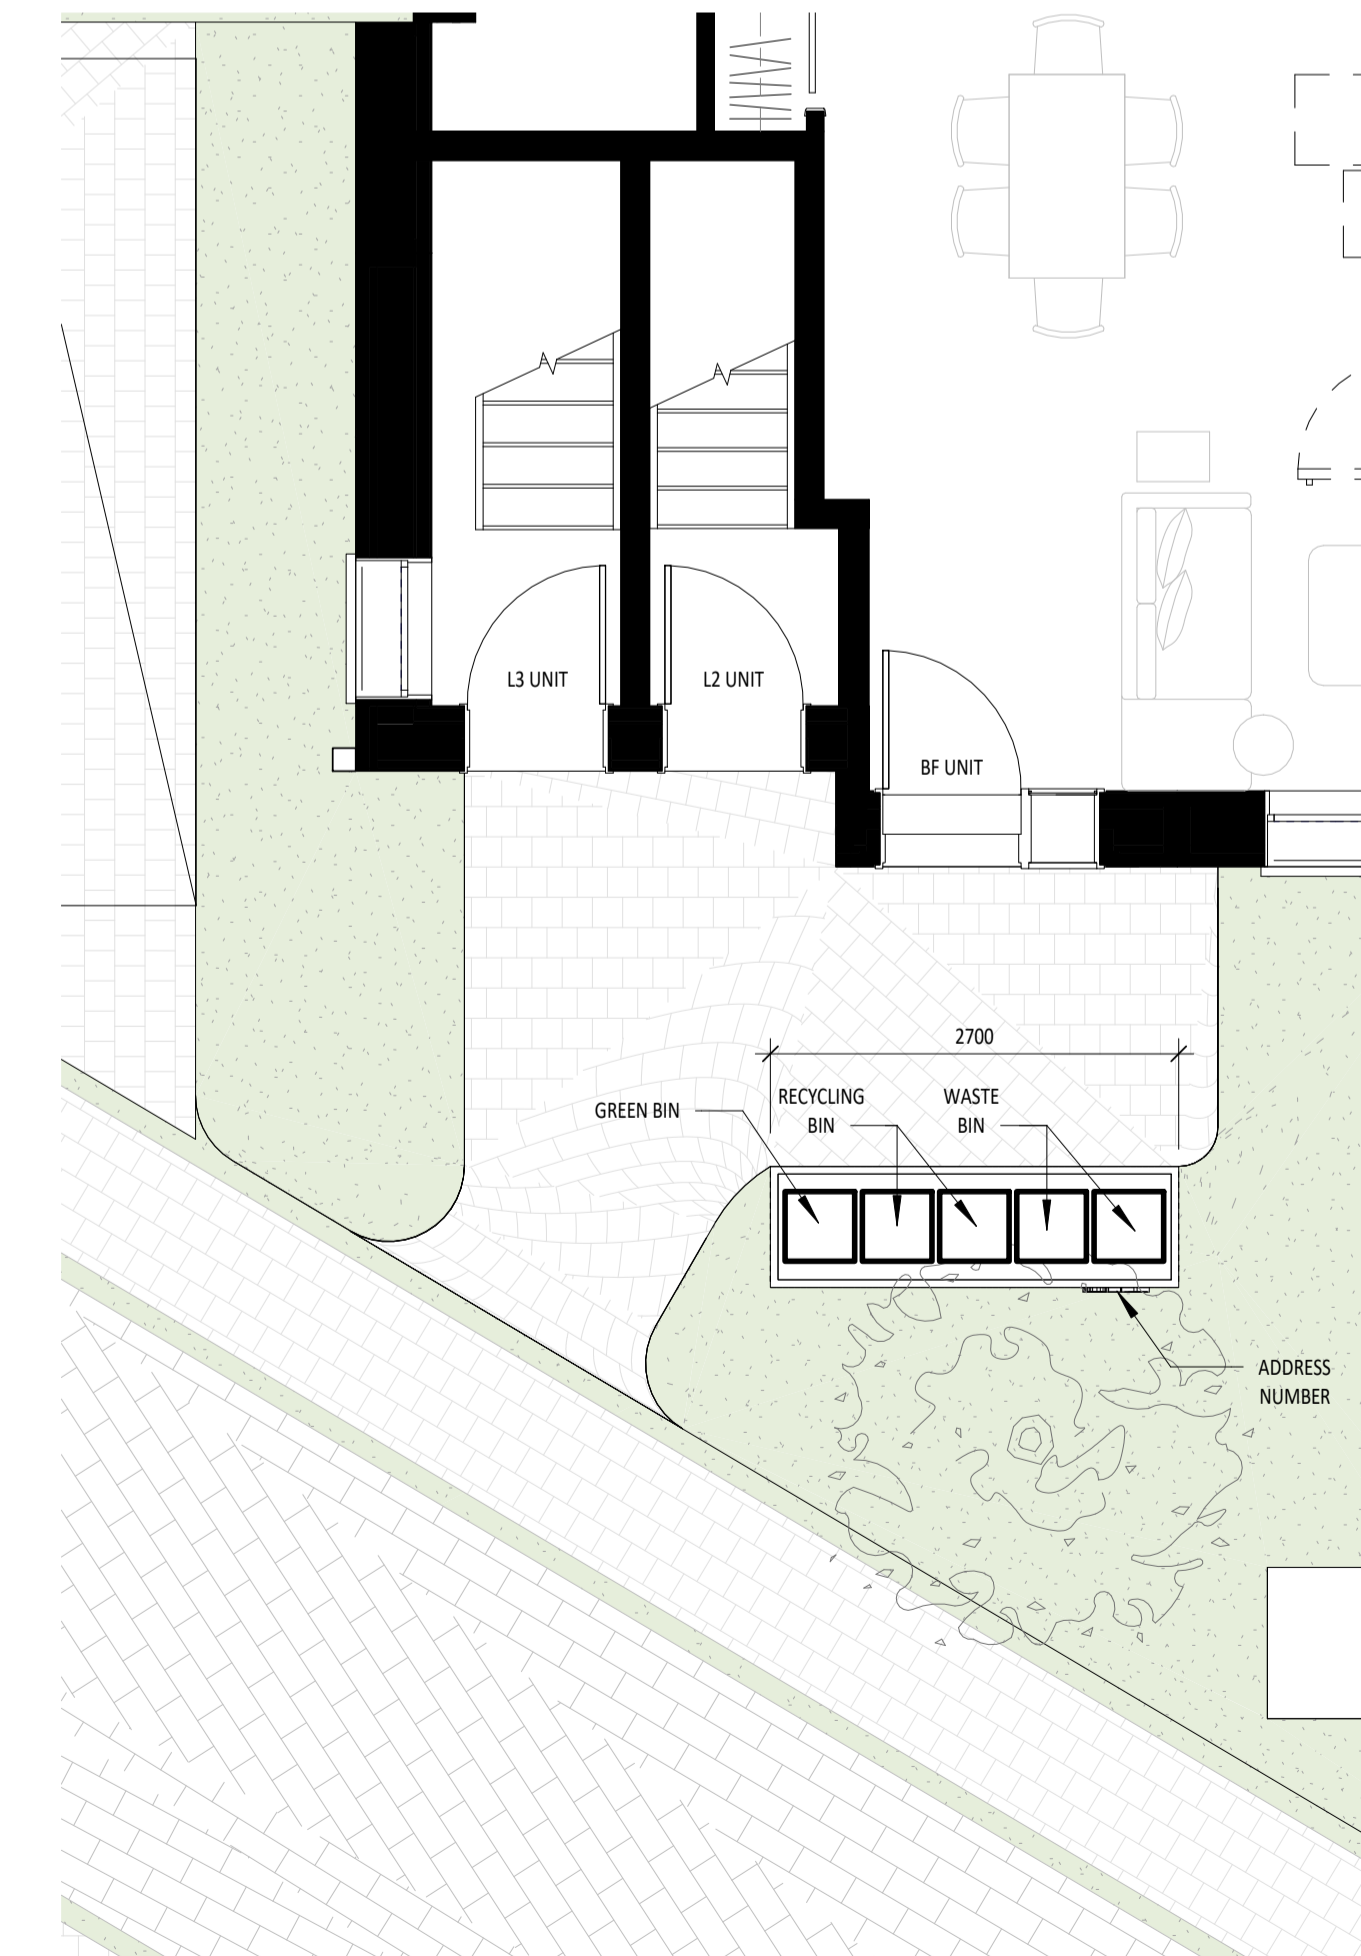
FRONT VIEW OF THE TYP. TOWNHOUSE
